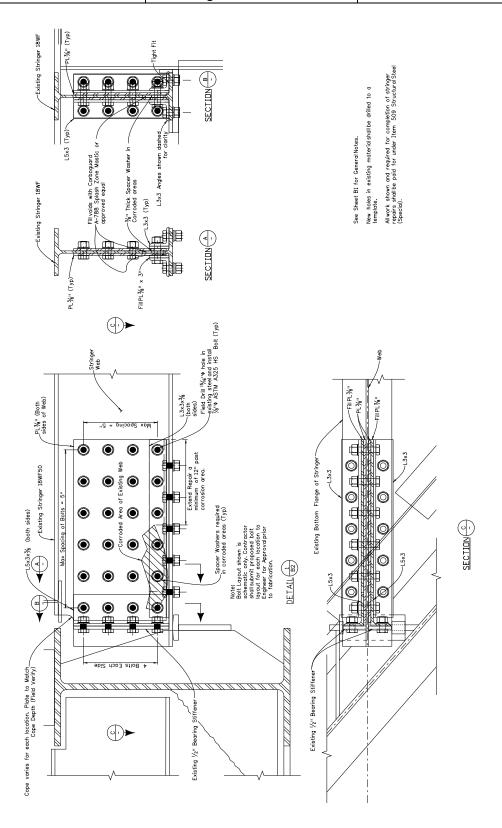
(K)-1 Sample Details for Adding Steel Plates to a Corroded Girder
